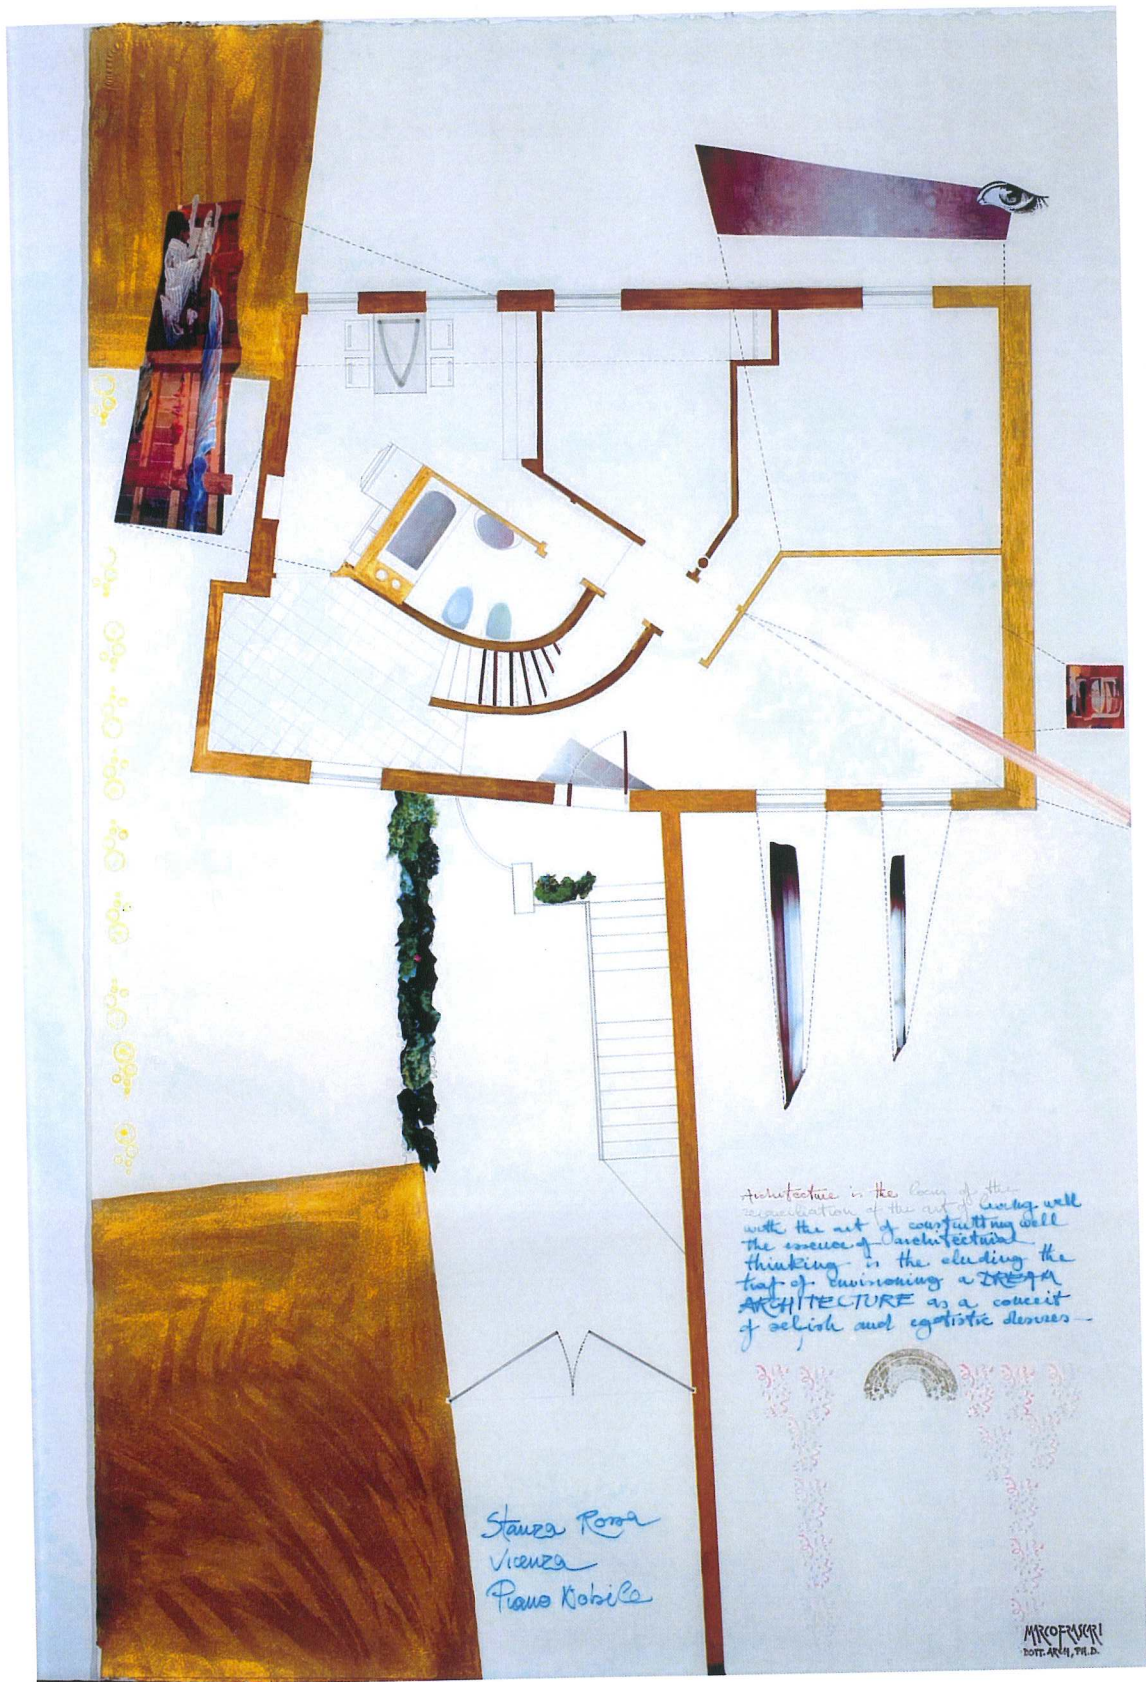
Casa Rossa, Post-Construction Technography, Piano Nobile
